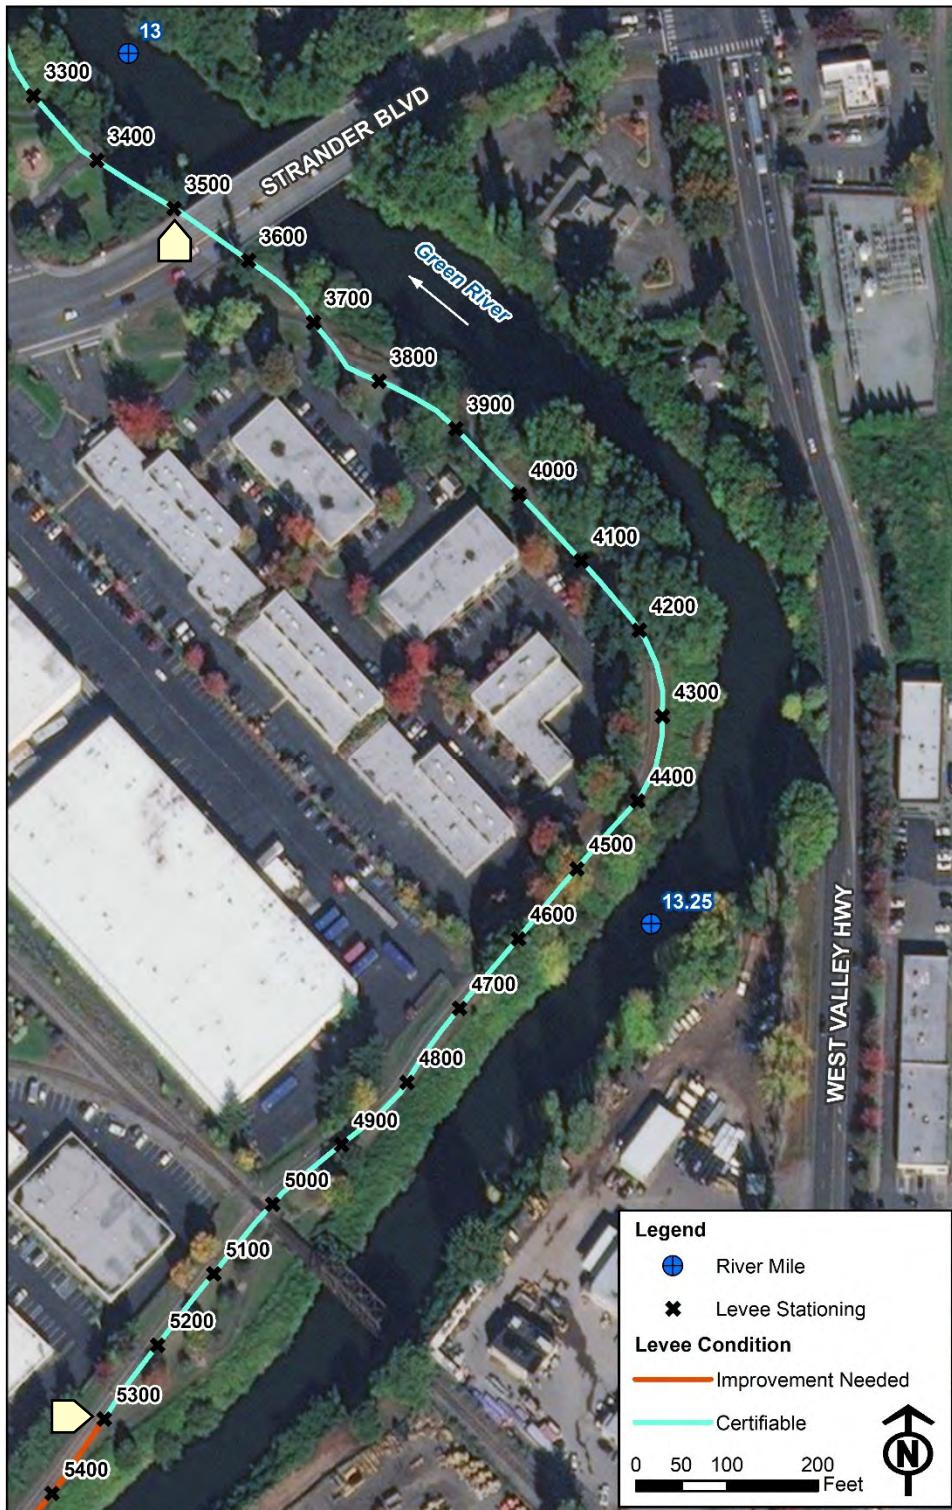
Tukwila Levee segment where existing section 3500 to 5300 can be certified.
